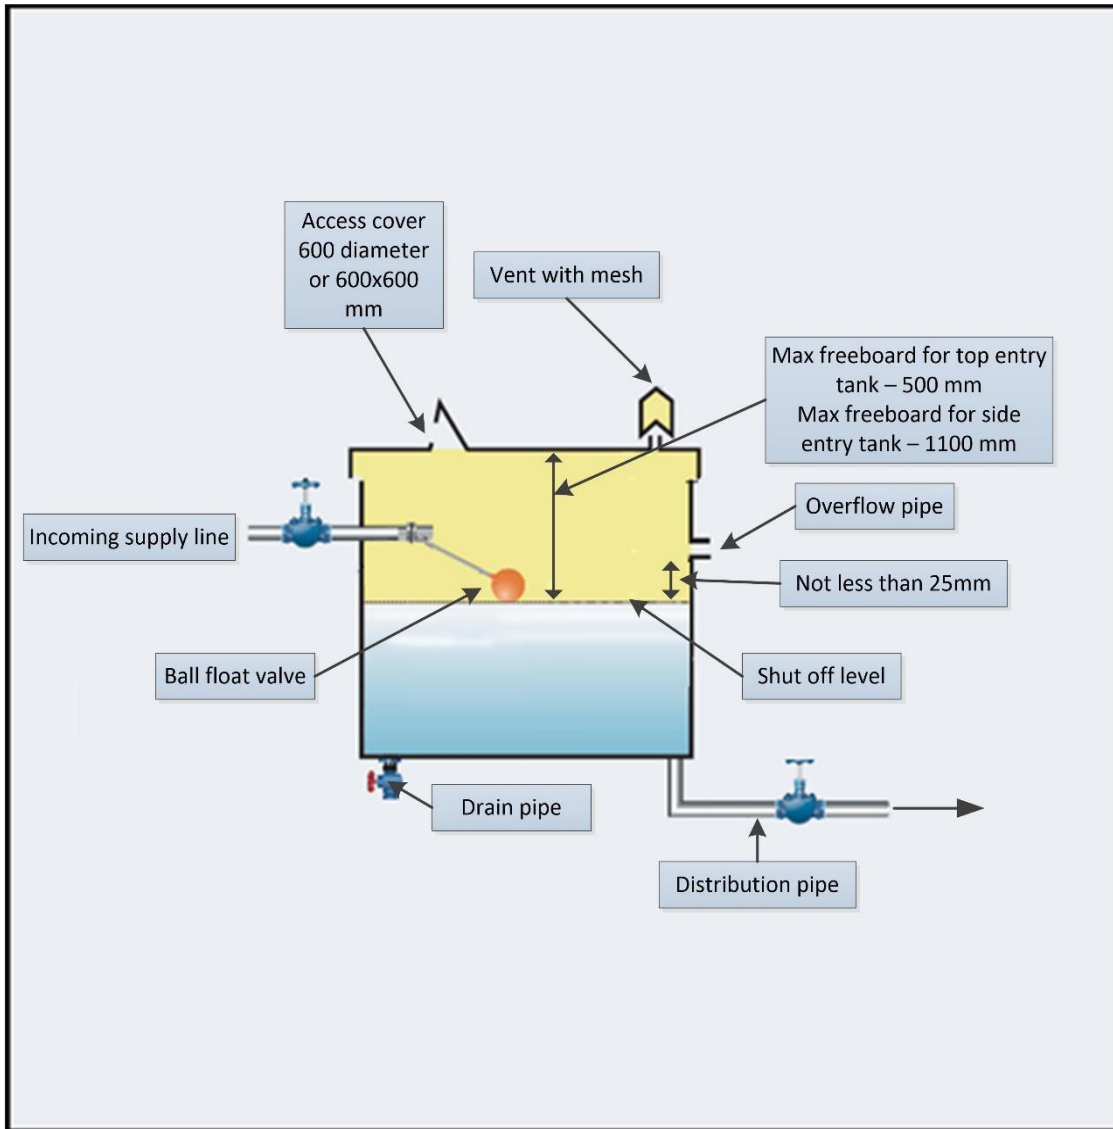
A typical Roof/Ground Storage Tank connection arrangement
